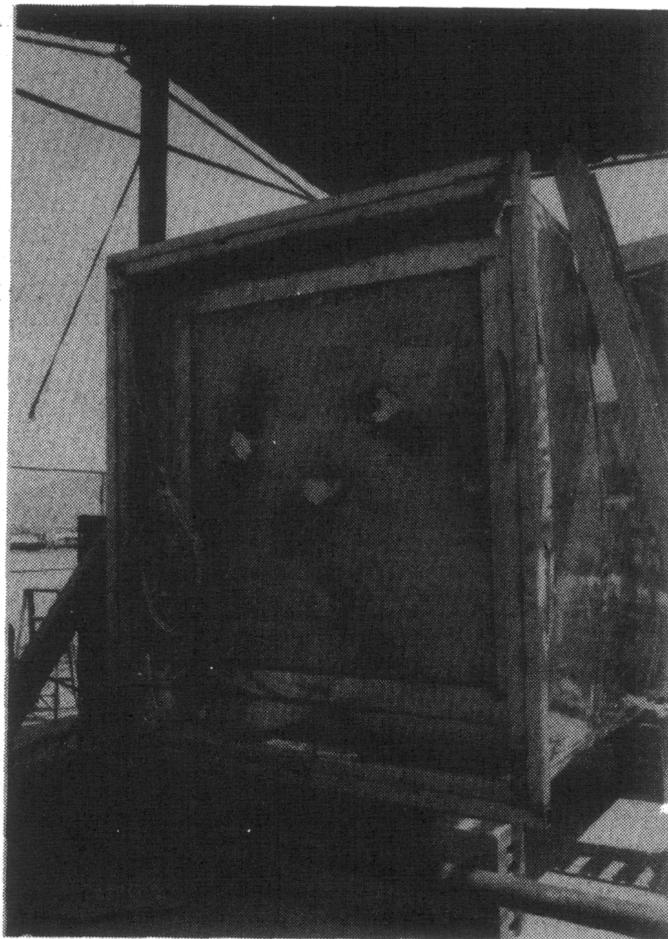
Sealing Plate for Cut End of Containment Liner
